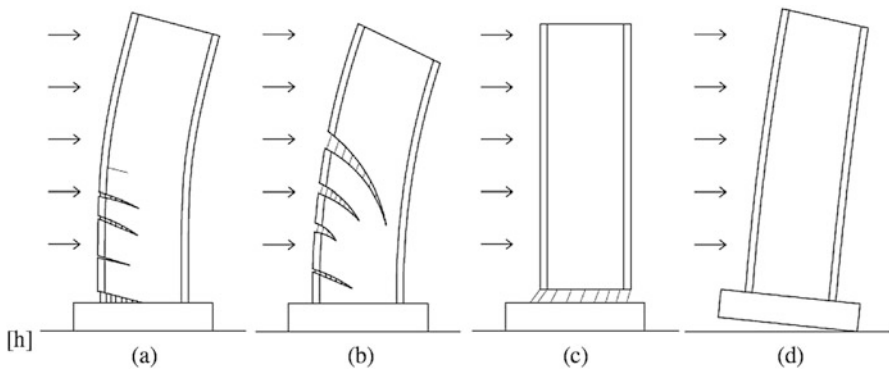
Shear wall failure mechanisms. (a) Bending; (b) Shear; (c) Sliding; (d) Overturning
